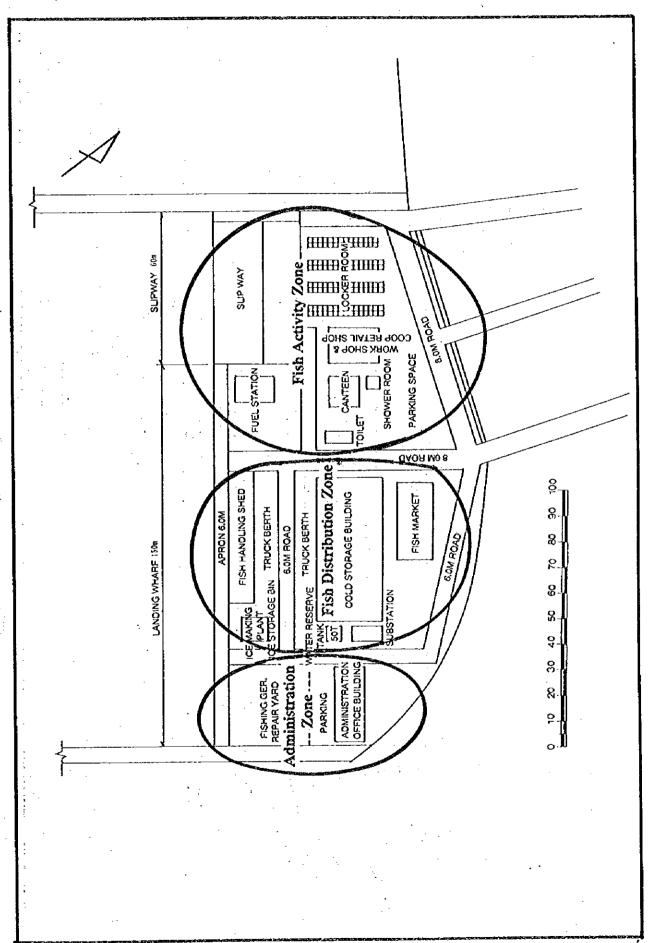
Zoning of functional facilities (Alternative plan-2)
